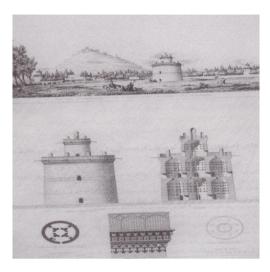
Section, elevation, and plan of a pigeon tower, By Pascal Coast.
